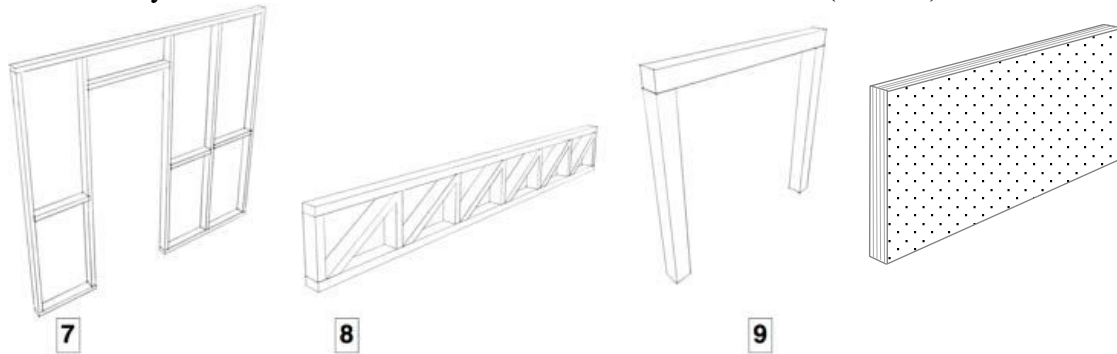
Wall frame (No. 7). Floor and/or roof trusses (No. 8). Post and beam assemblies (No. 9) and massive timber panel (far right).
